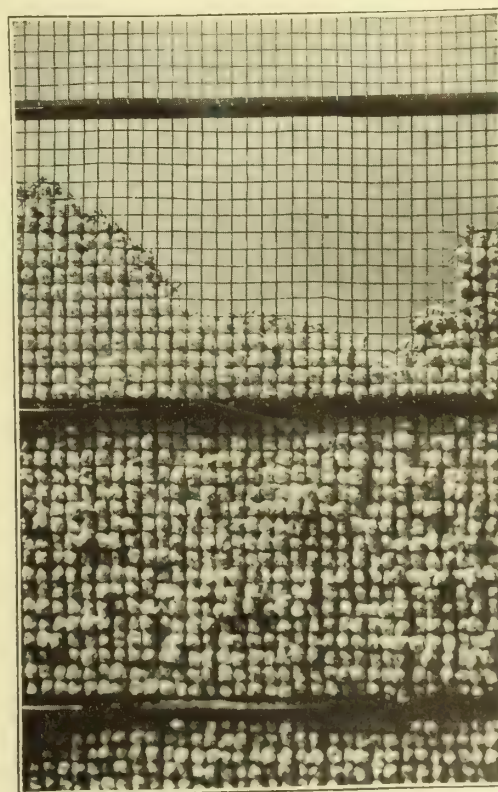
BACK VIEW OF WRIGHT STIFFENED WIRE LATHING
